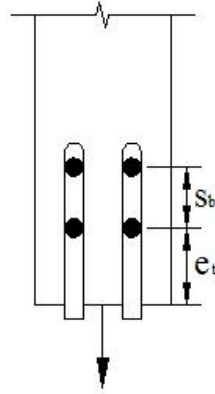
Observed row failure modes for timber bolted connections loaded parallel-to-grain
